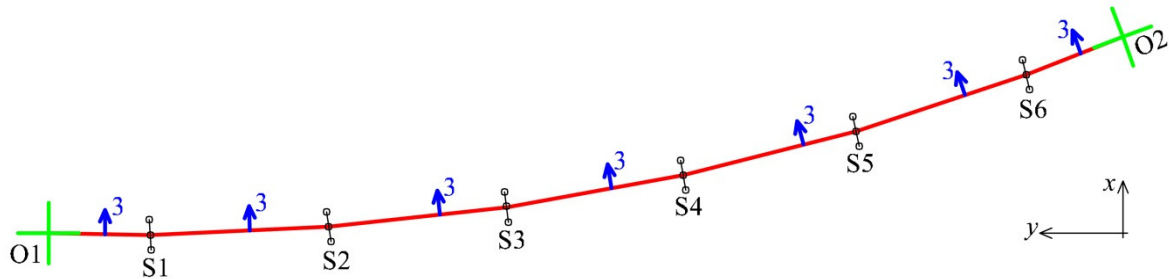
Bridge plan with local axes of the piers (blue – axis 3, green - abutments)
